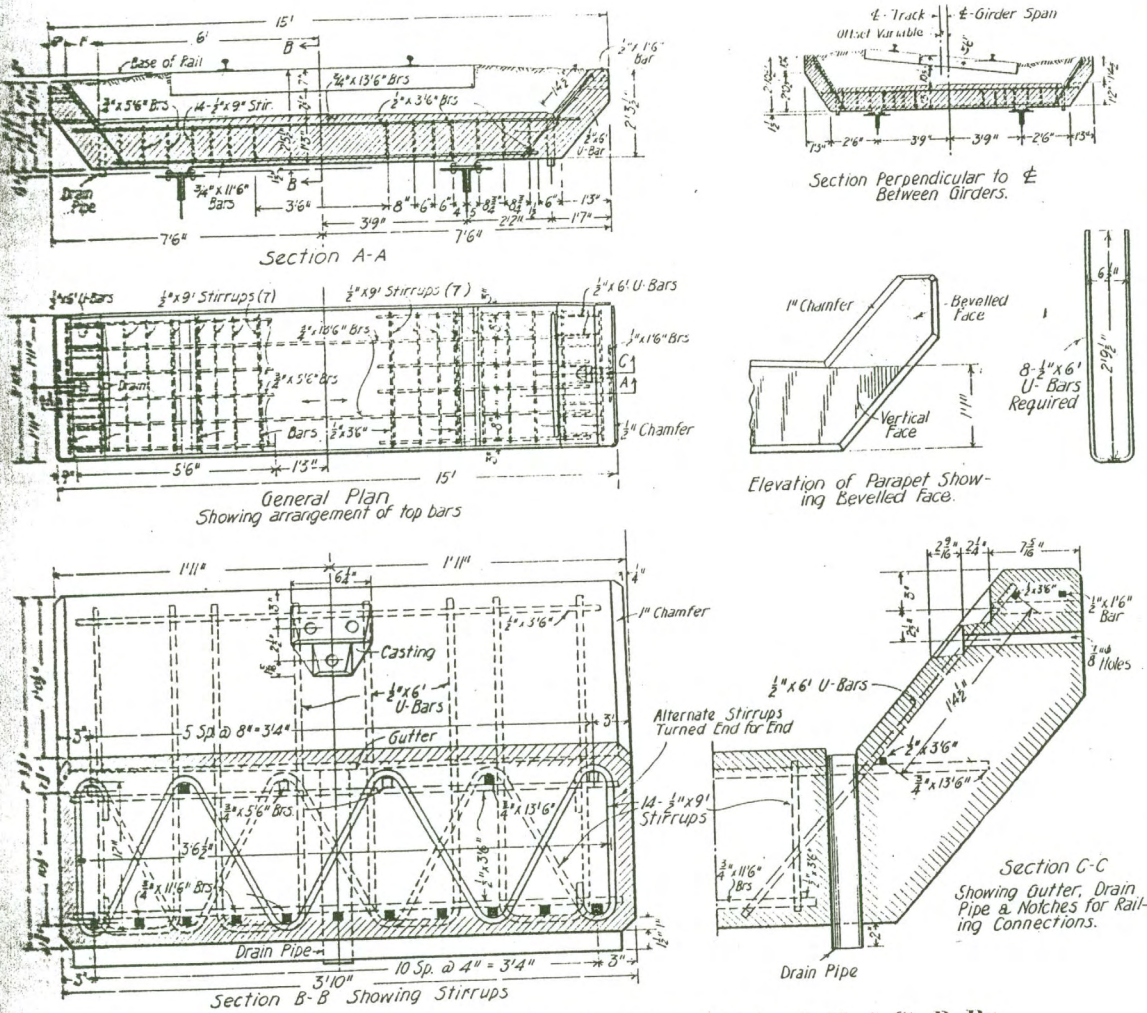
Standard Reinforced Concrete Bridge Deck Slabs, C. M. & St. P. Ry.
